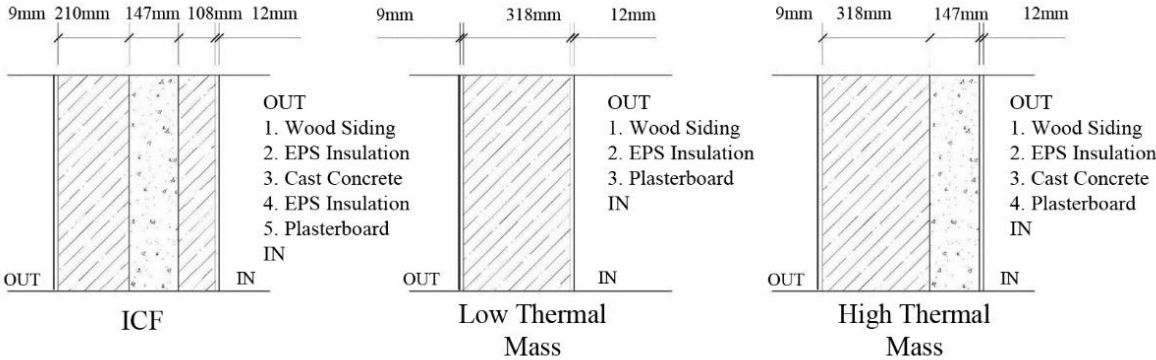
Cross-section of the three wall construction methods (ICF; LTM; and, HTM)
